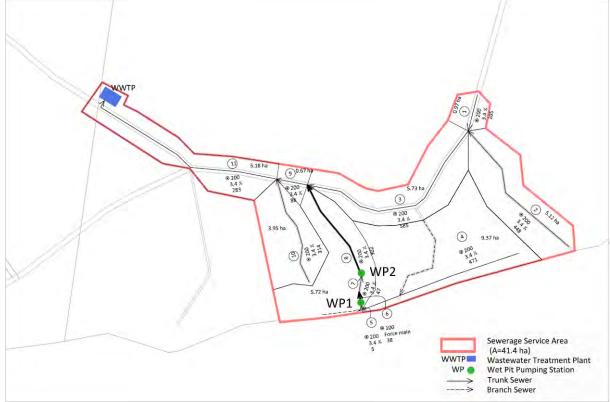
General Layout Plan (Alona Beach Sewerage System)
